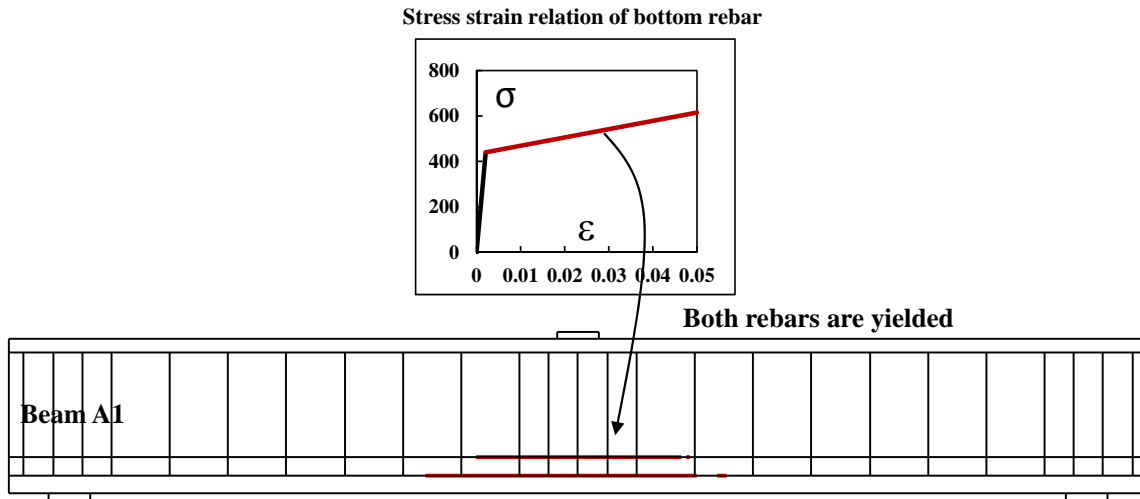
Beam A1, yielding of bottom rebars at peak load
